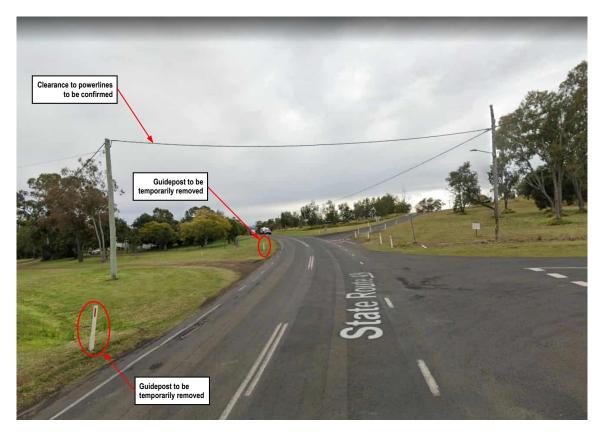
Bunya Highway / Crawshay Street Intersection (Location 14) Looking North-East
